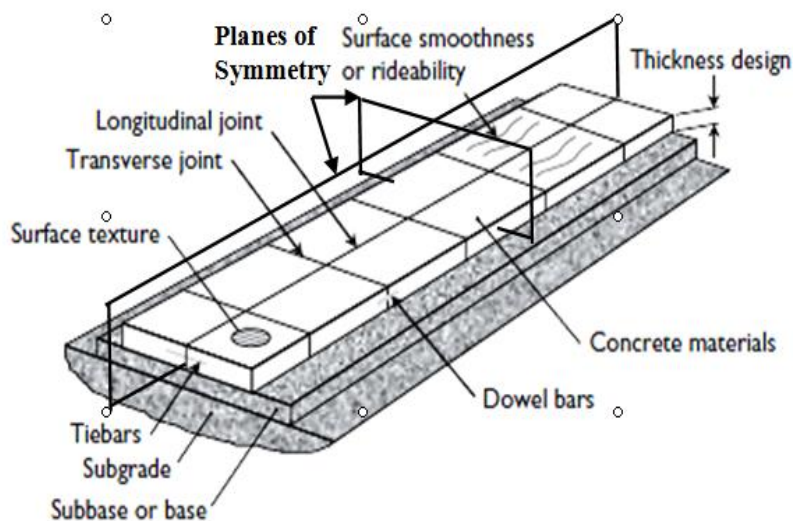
Schematic Diagram of a Jointed Plain Concrete Pavement.
